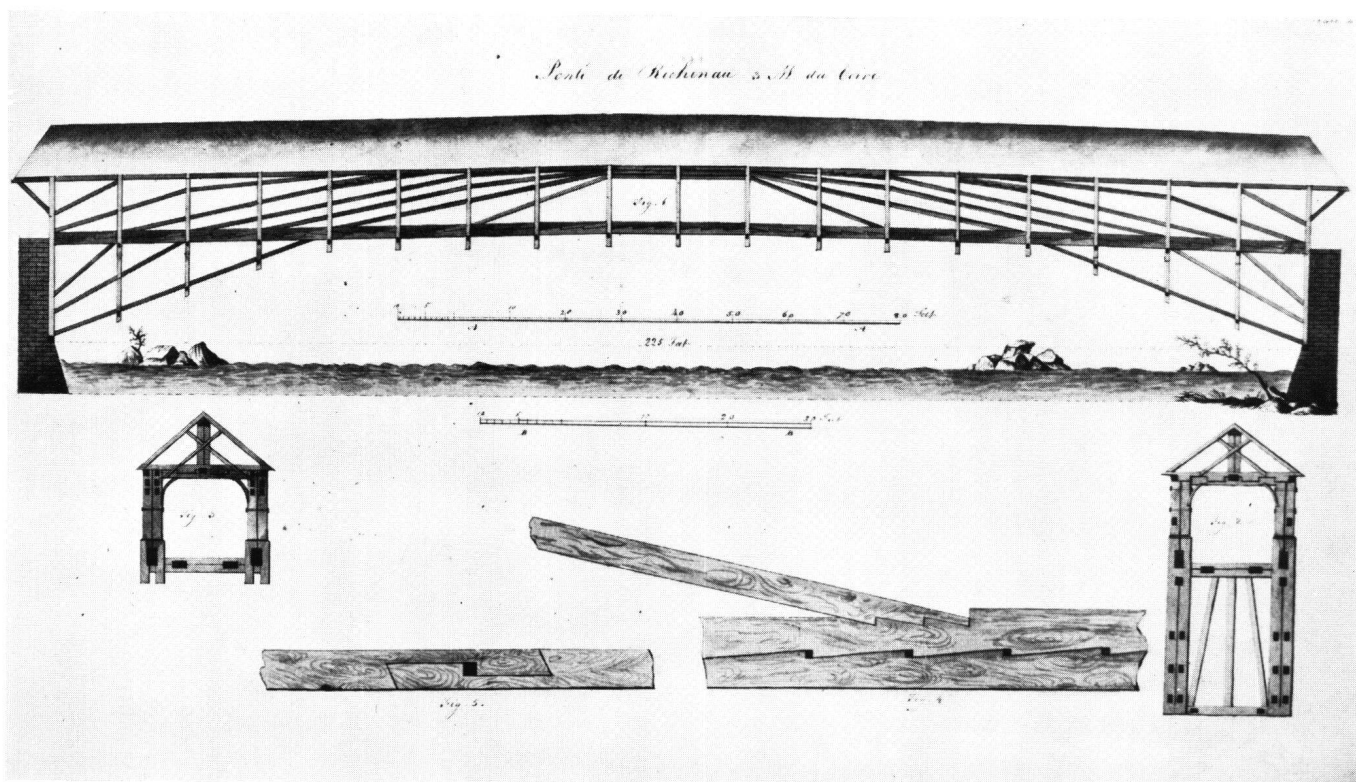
Long bridge at Reichenau; watercolour copy of a print after Michael Shanahan showing elevation, sections and details
